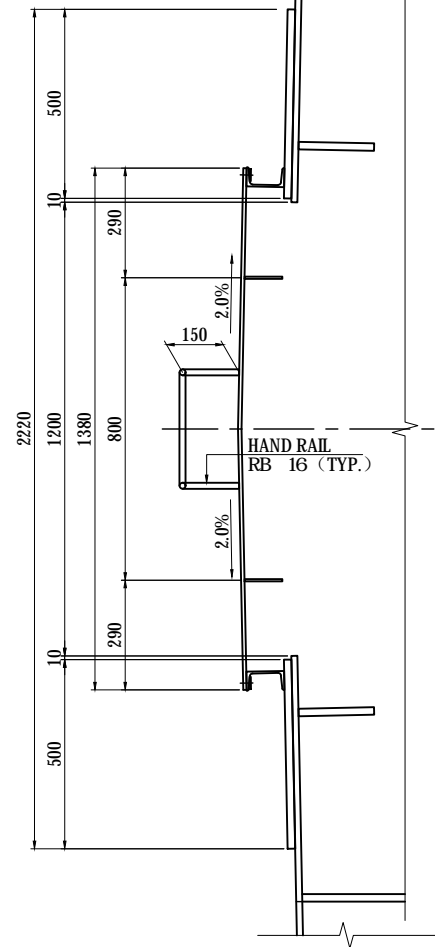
DETAIL OF MAIN GIRDER STANDARD (9) S=1:20
